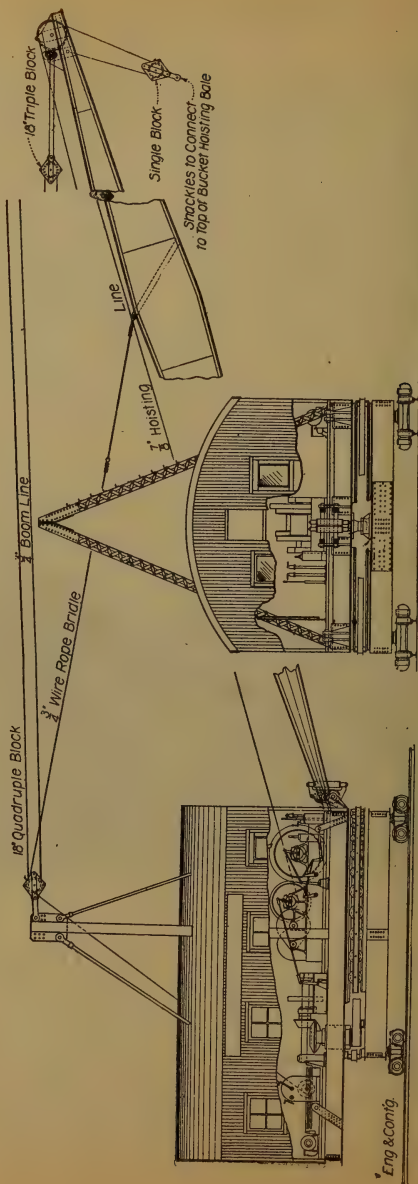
Arrangement of Operating Machinery of Electrically Operated Dragline Excavator.
